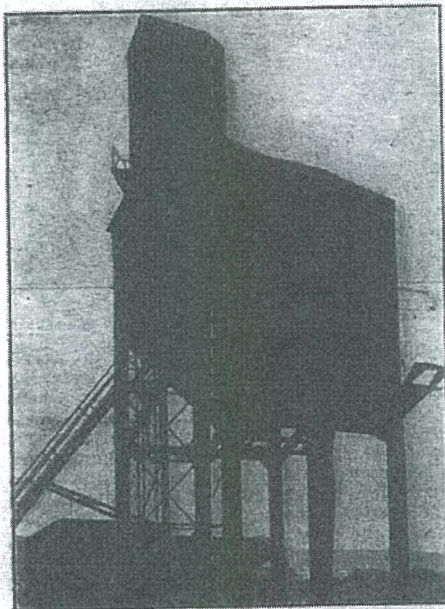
Coaling Plant Similar to N.T.R. Design.
